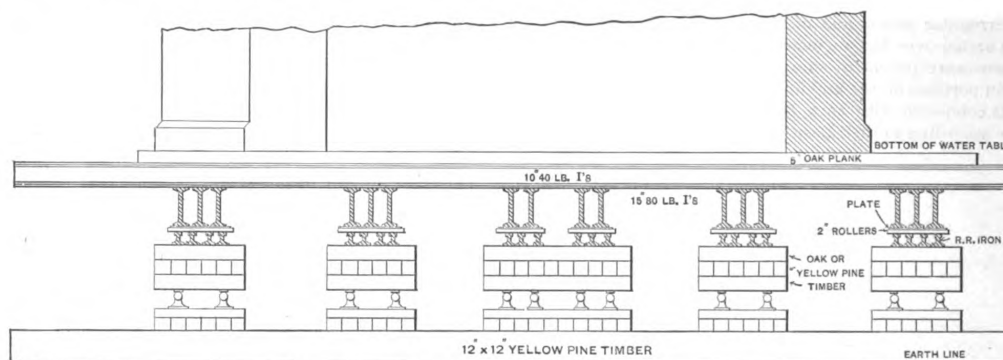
Section Through Tower Loading, Looking South or Toward Destination.
